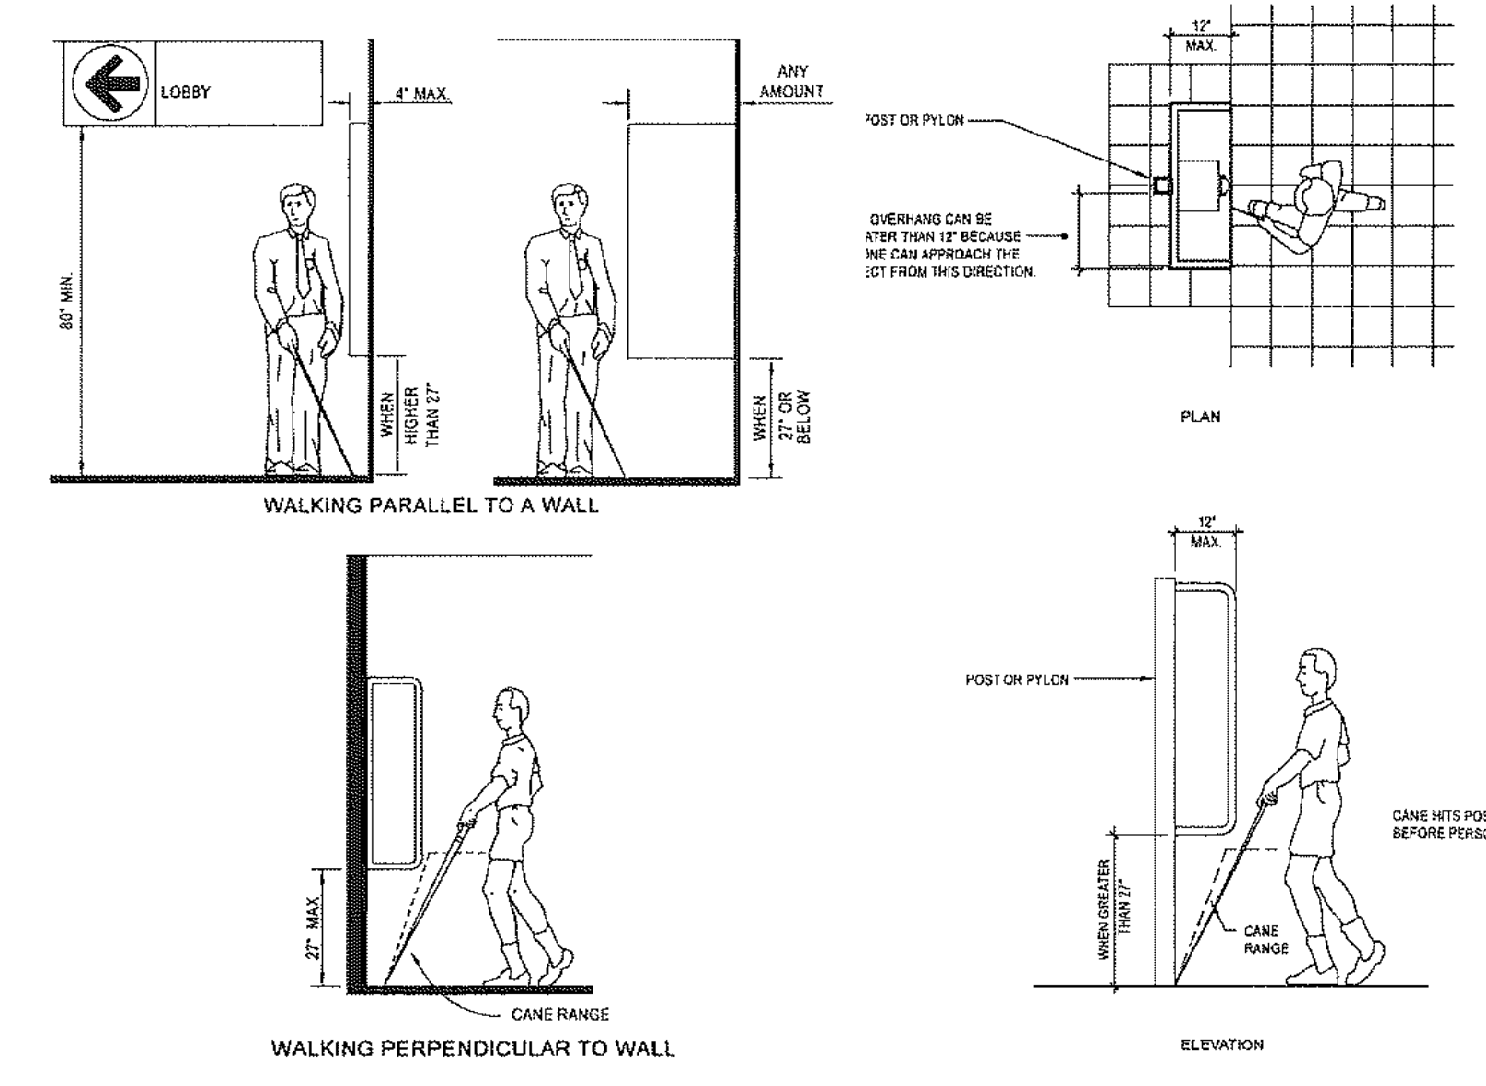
B-7A - PROTRUDING OBJECTS WALL MOUNTED
